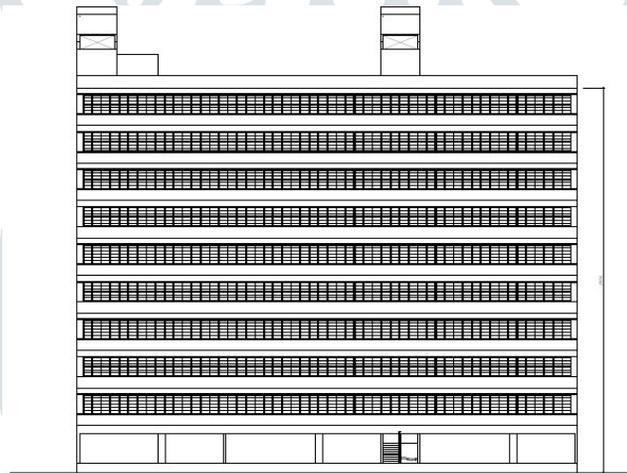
THE INNER ELEVATION OF THE EWS BLOCK (Source: Author 2022)
